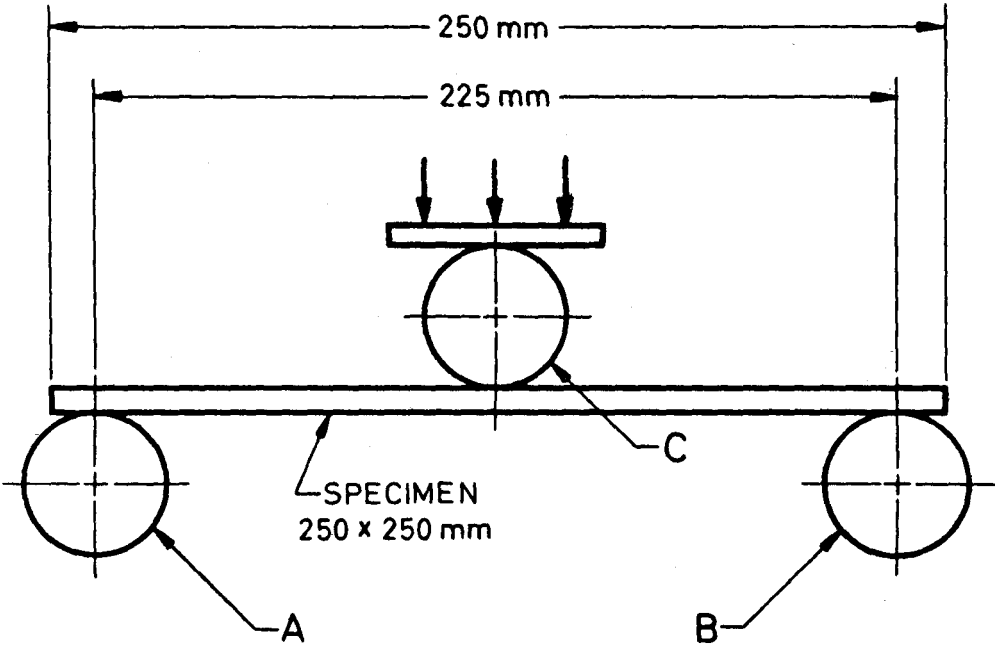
LOAD BEARING CAPACITY TEST FOR FLAT SHEETS
